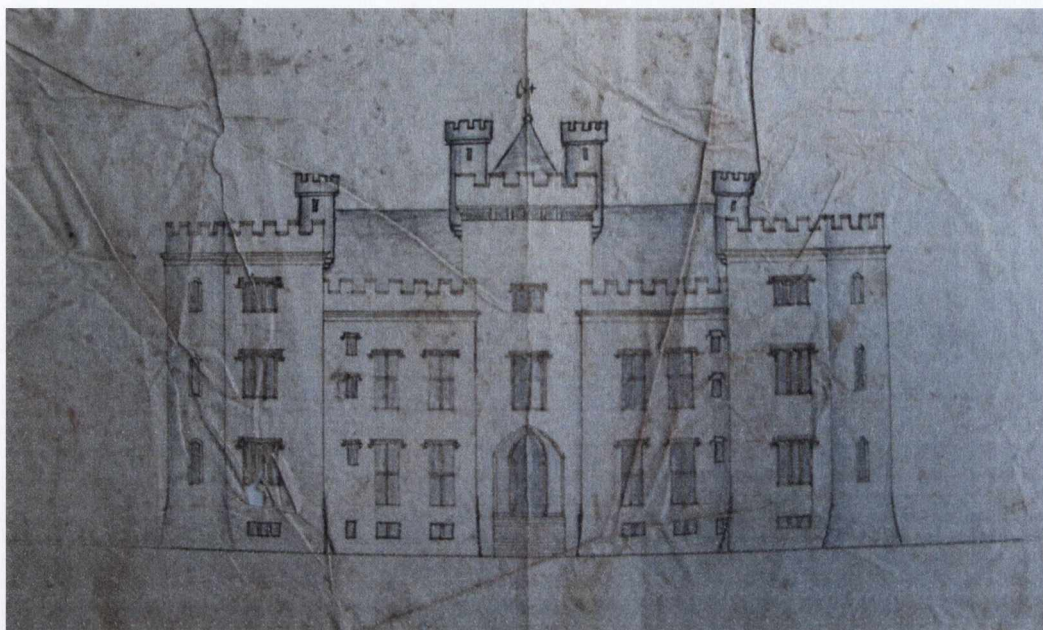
Birr Castle, proposed north elevation, attrib. to John Johnston, [1802–1803], Rosse papers, O/17/10.
